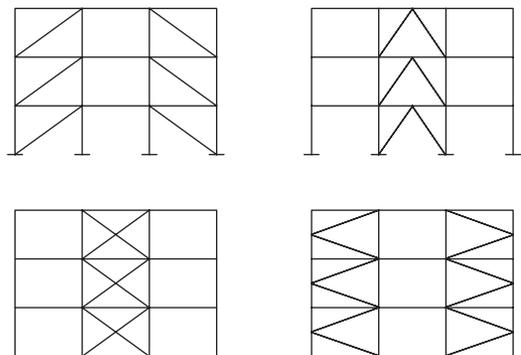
Typical configurations of concentrically-braced steel frames using hollow sections as bracings.
